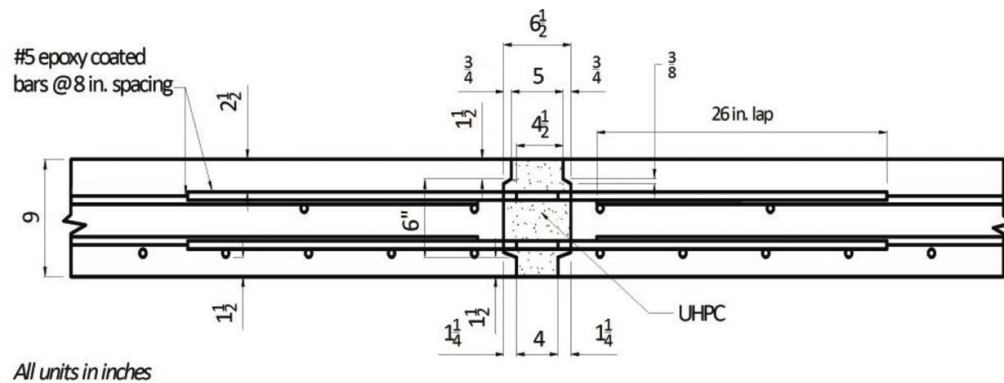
Joint detail of precast concrete decks used by NYSDOT [22].
